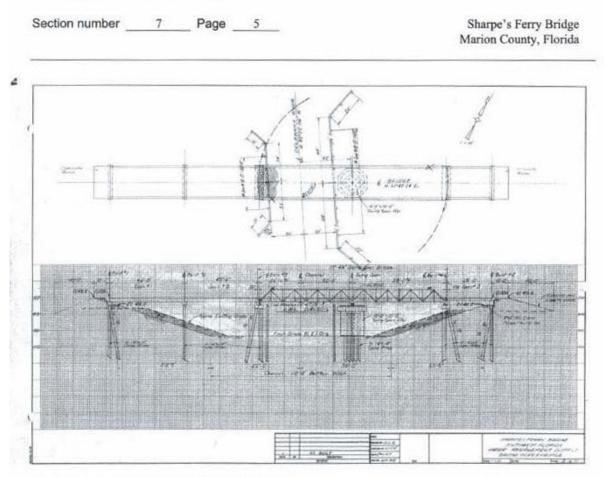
Sharpe's Ferry Bridge Plan and Profile
